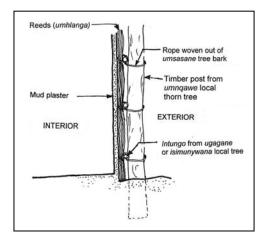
Cross section of a Reed wall with Exposed timber frame
